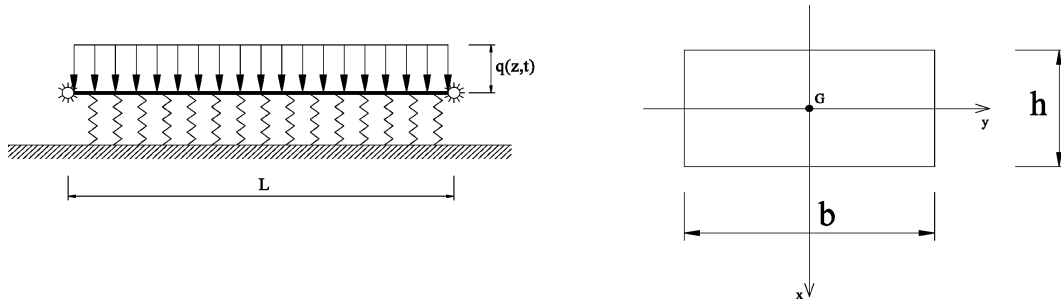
Hinged-hinged beam on Winkler's medium and its cross section
